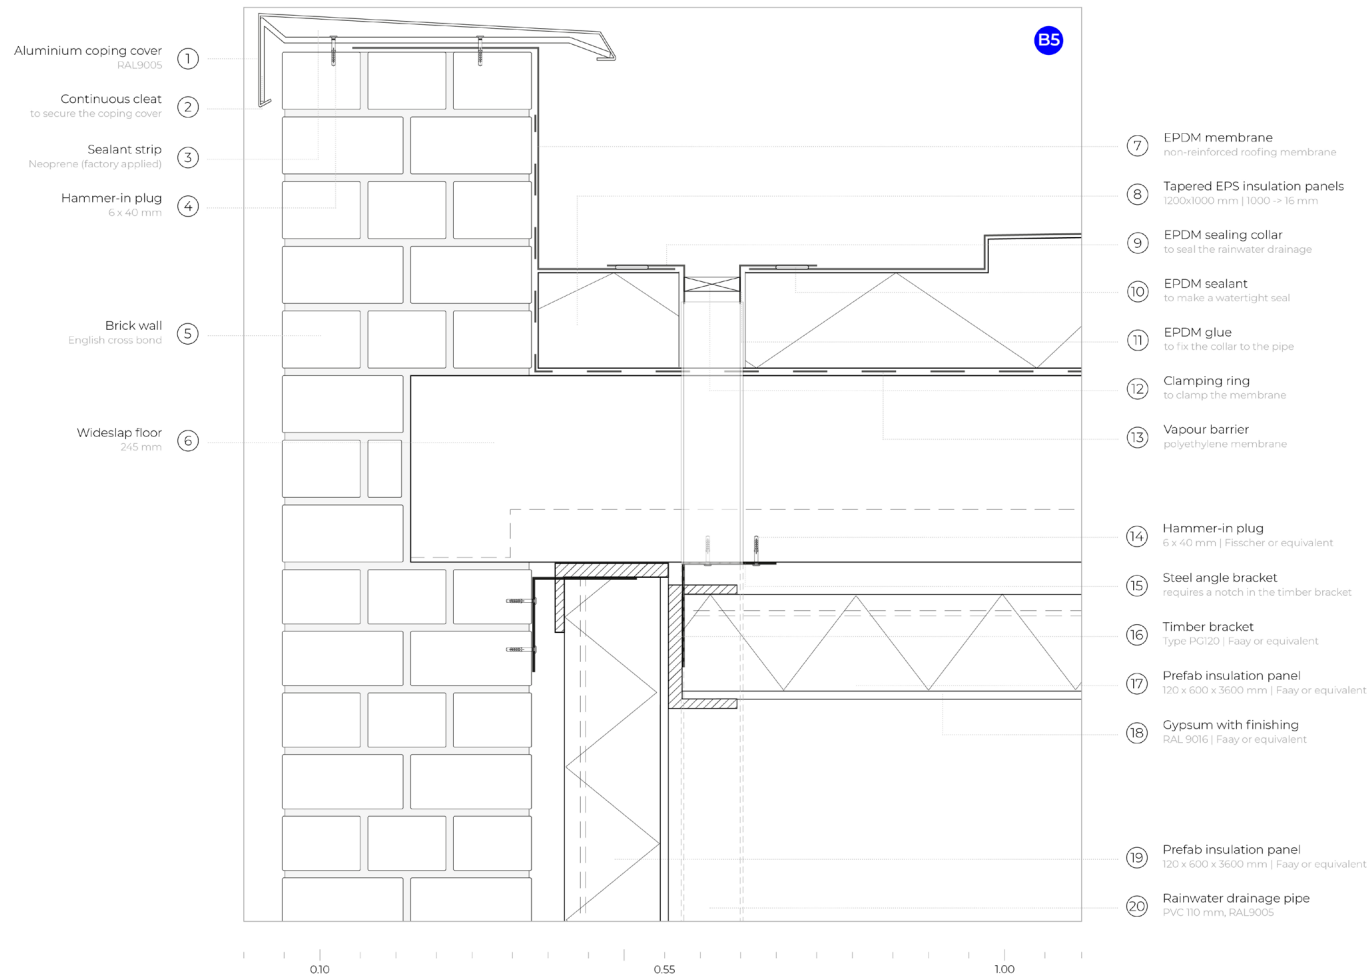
DETAIL DRAWINGS | VERTICAL SECTION B | SCALE 1:10
